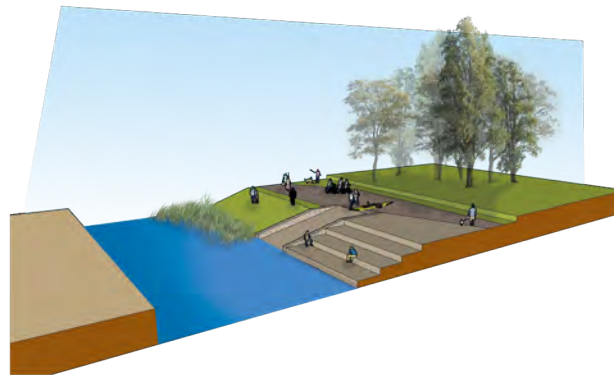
| river edges with soft sloping edges, gabion construction slip access and steps
